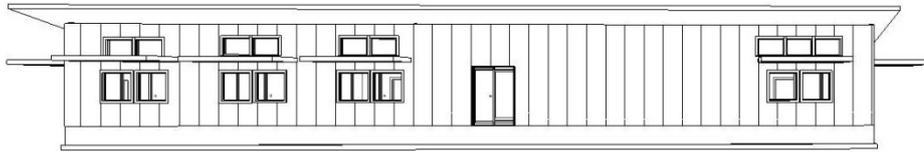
Revit 3D view of south facing wall of building
